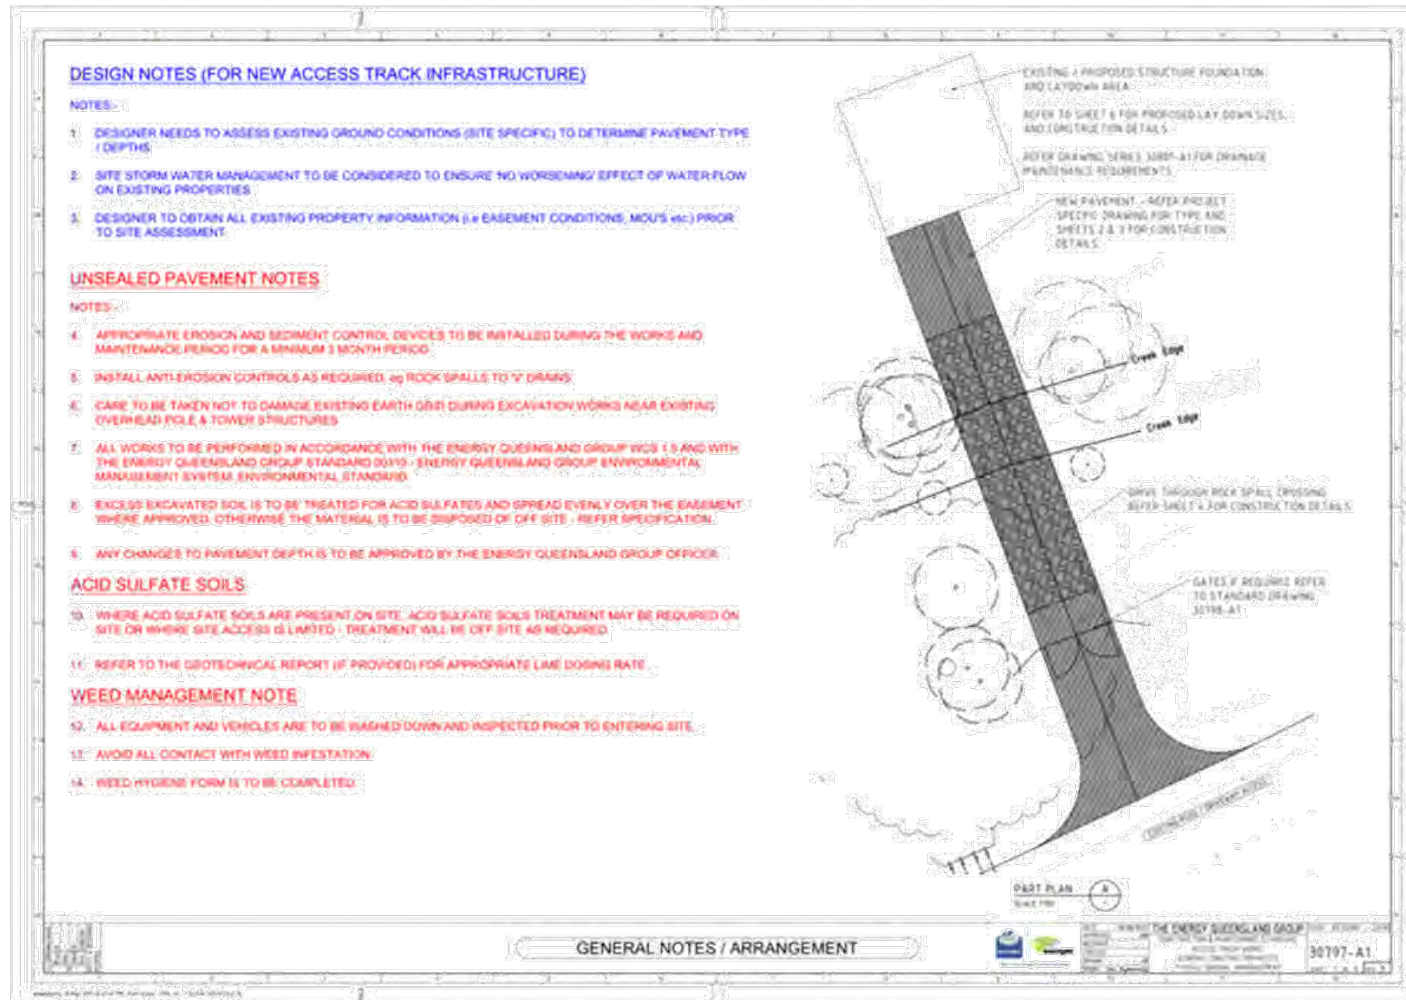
Access Track Infrastructure – General Notes and Typical Arrangement.
